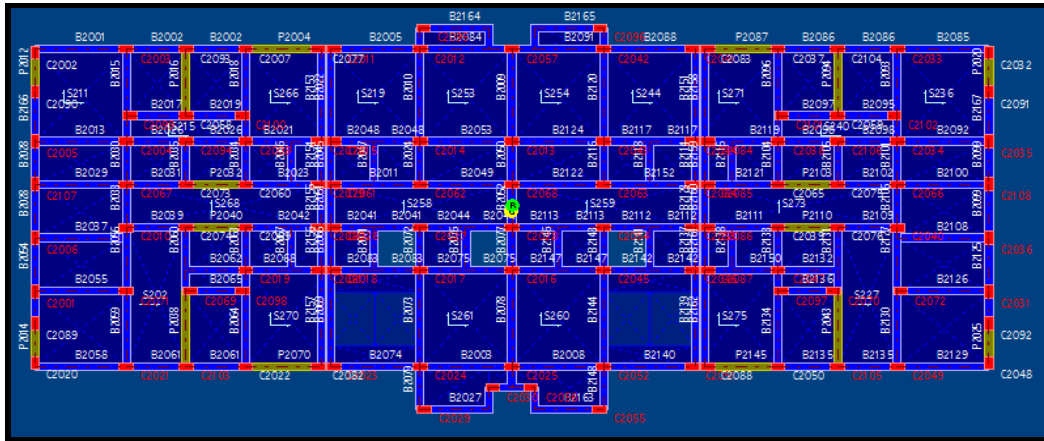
Plan of Twenty Five Stories and Stiffened Coupled Shear Wall System
